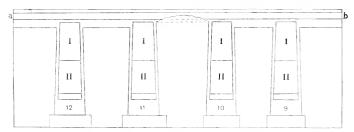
First Pitlared Hall : Pillars 9-12 : East Face, Scale 1 : 100.
